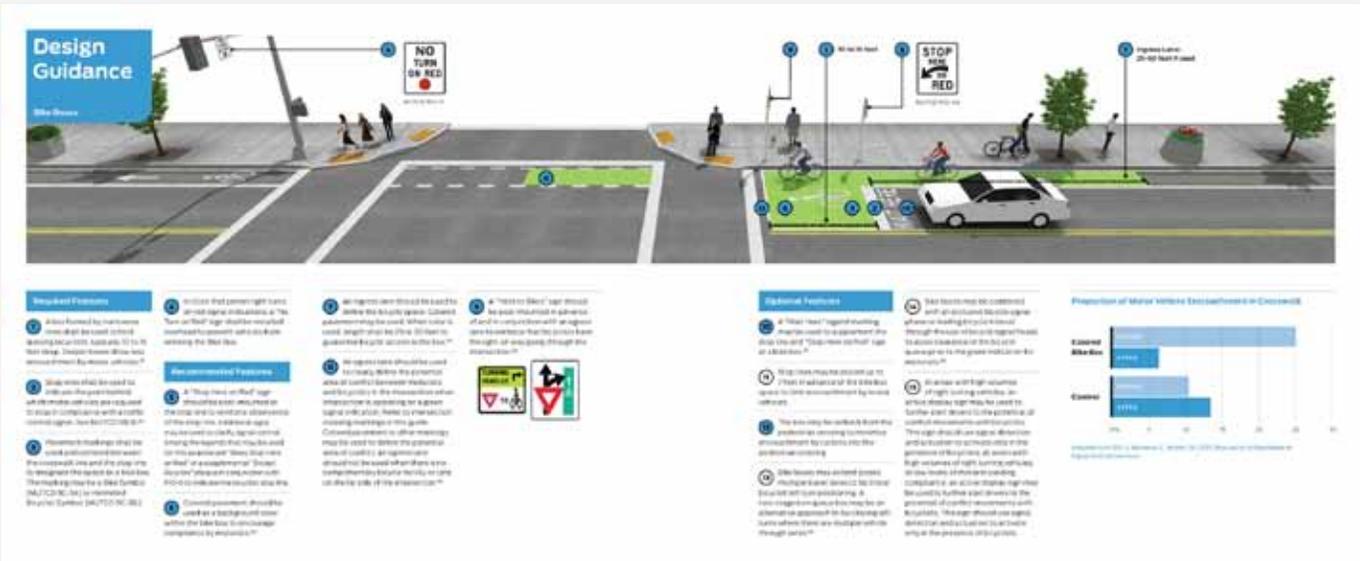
Bike Box Design Guidance. The NACTO Urban Bikeway Design Guide provides detailed recommendations for designing bike boxes at intersections. Image source: NACTO.
